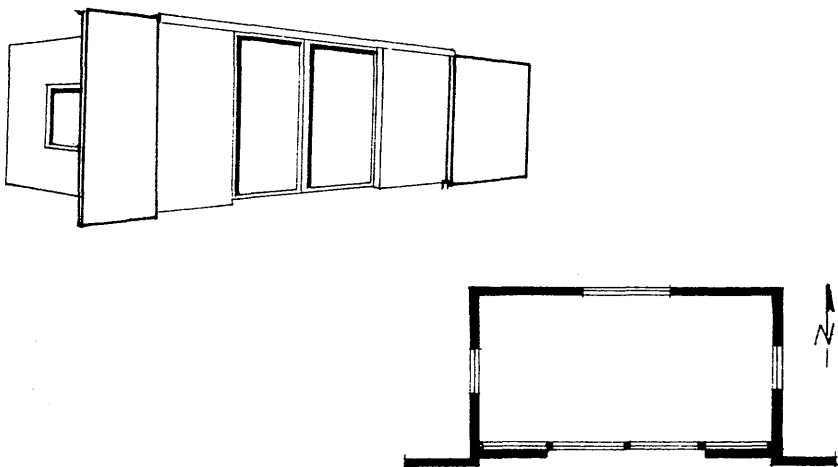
SOUTH WALL ALL GLAZED
